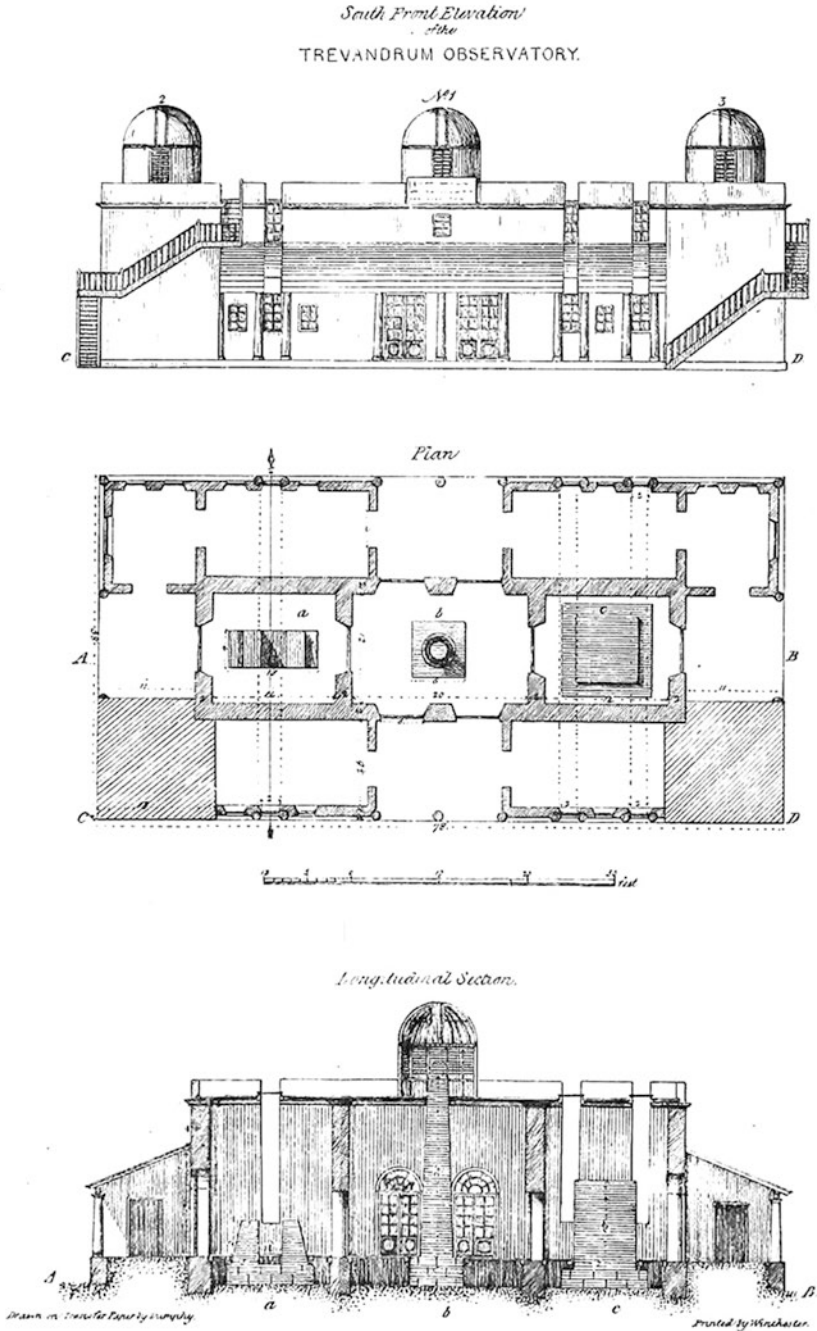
Drawings made in 1837 of the section, plan and elevation of Trivandrum Observatory (<https://en.wikipedia.org>)
